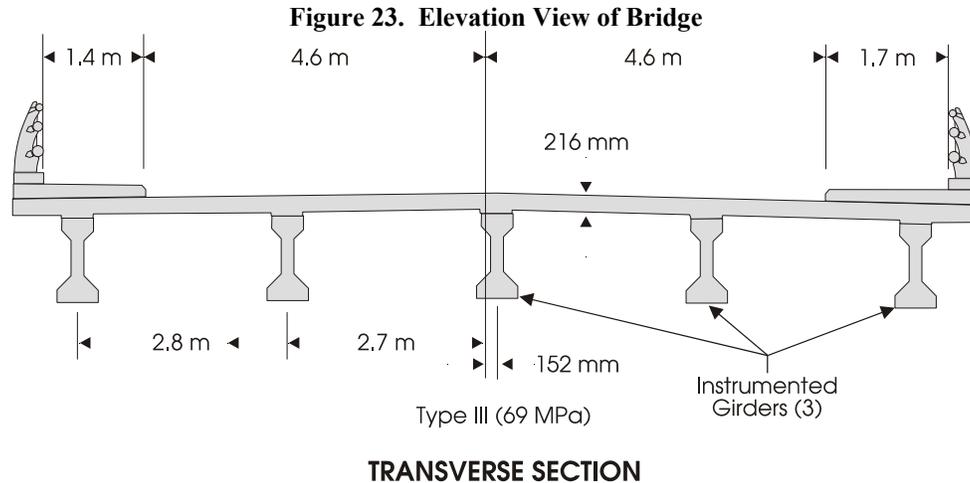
Transverse Section of New Bridge Showing Location of Instrumented Beams
